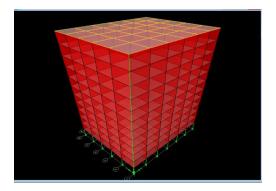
Elevation of twelve storeyed Building Model 2 (ground soft)
